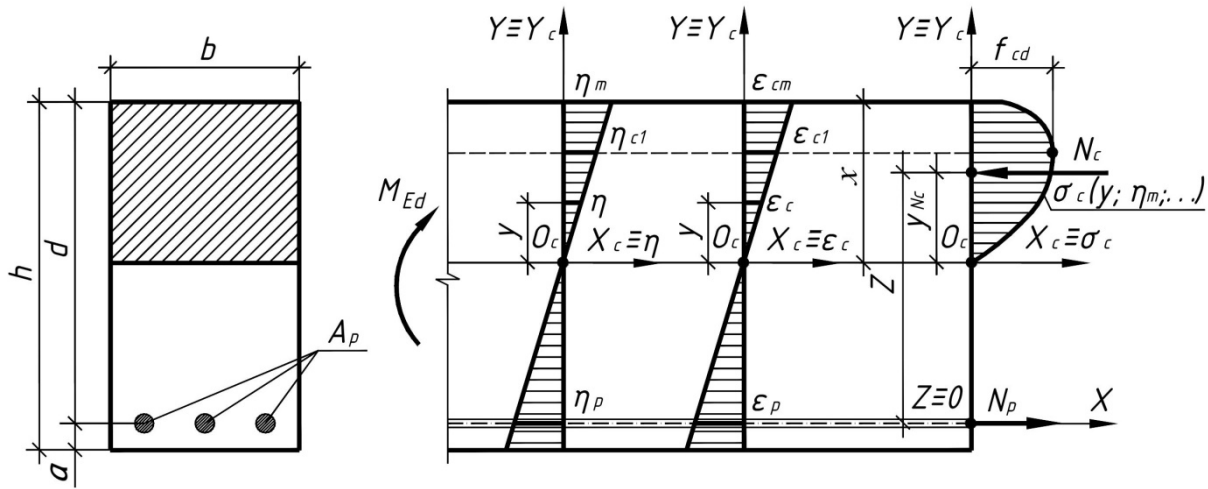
Design diagram of forces, stresses and strains in the cross-section of a concrete member reinforced with high-strength reinforcement
